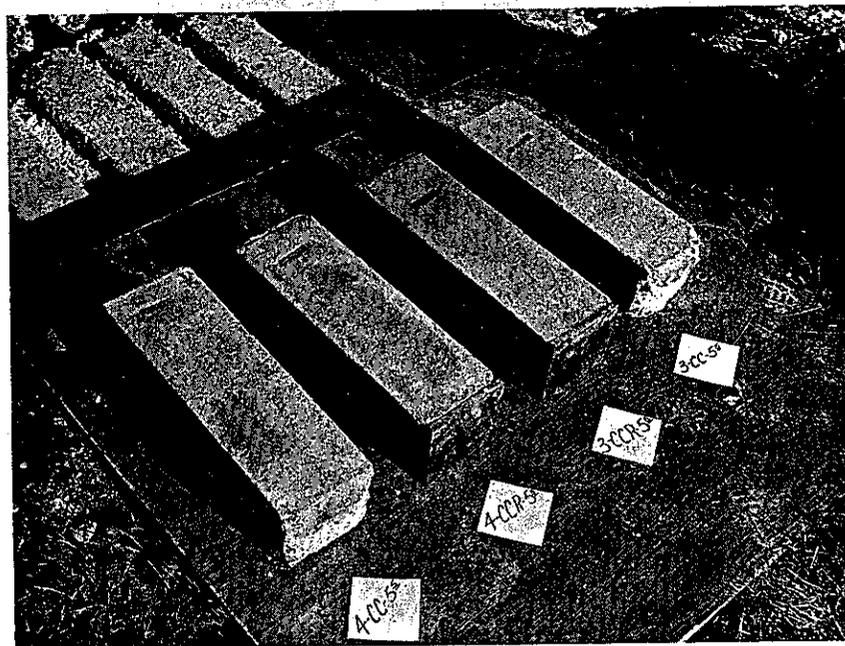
5.5-sack shrinkage compensated cement concrete beams after 14 months sulfate exposure. Middle two beams are externally restrained.
